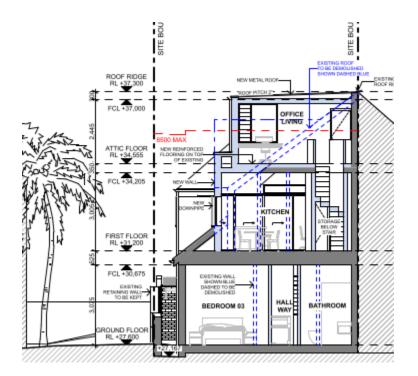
Plan Extract: Section BB Illustrating the existing and proposed building height.
